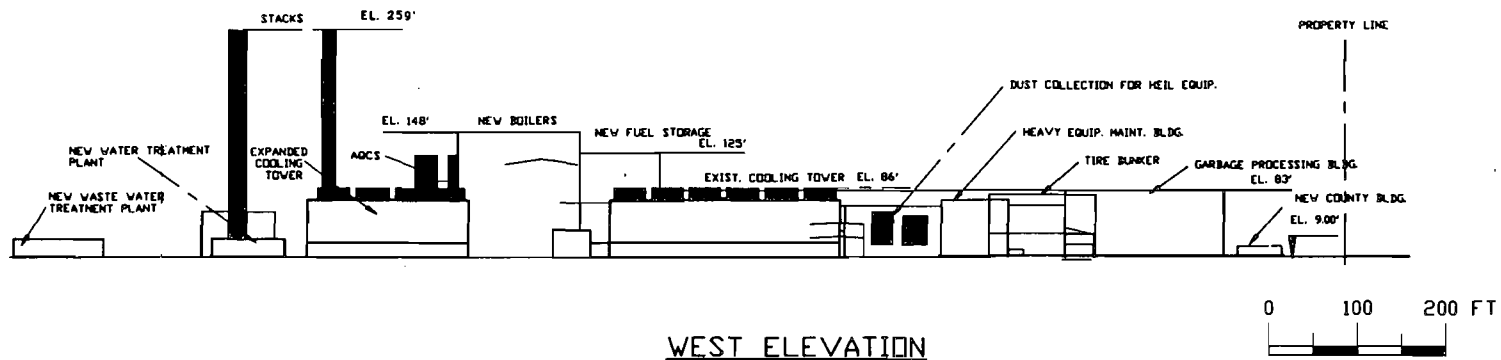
NORTH-SOUTH PROFILE VIEW OF EXPANDED DCRRF
